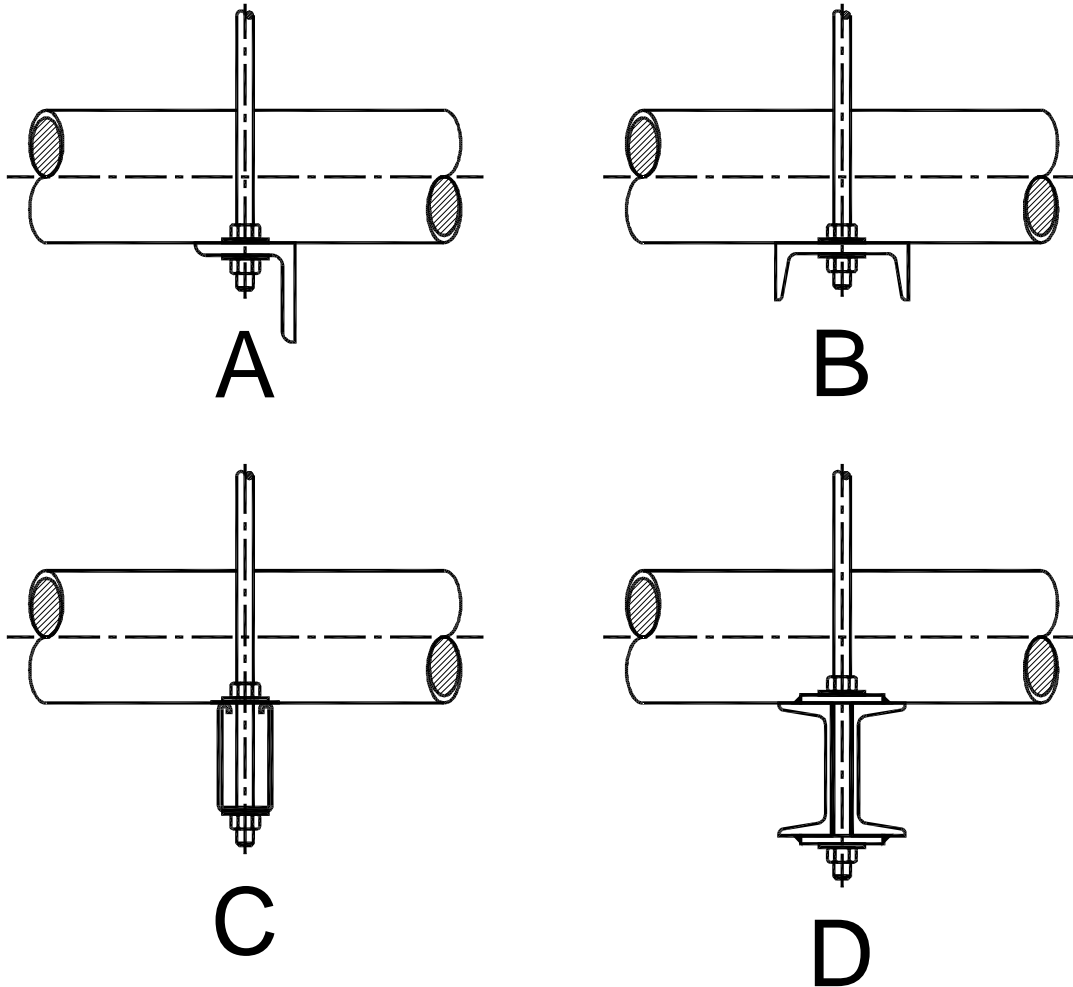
; Some Common Trapeze Bar Design Configurations Used for Supporting Pipe
